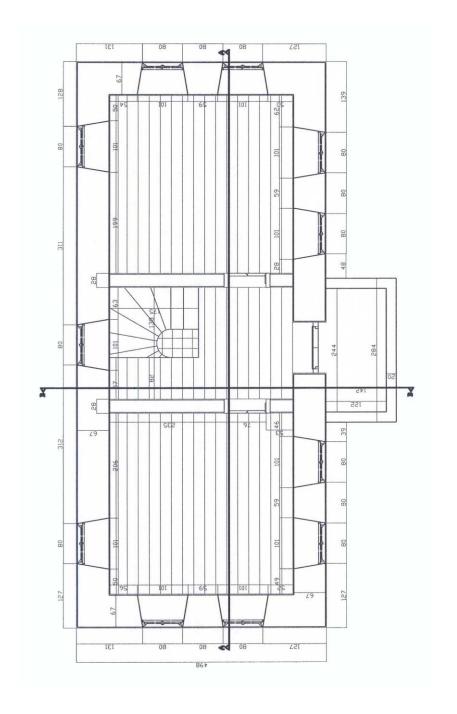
First Floor Plan of 1-Artemis Street Scale: 1/75
